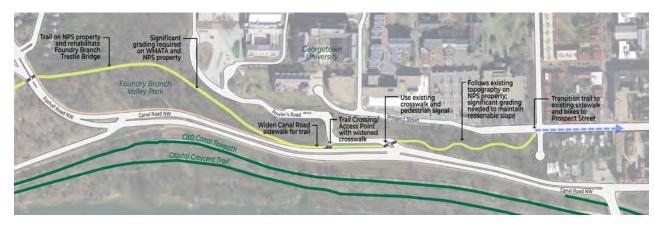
Option 5 - Foundry Branch Trolley Trestle Bridge to Canal Road to Prospect Street
